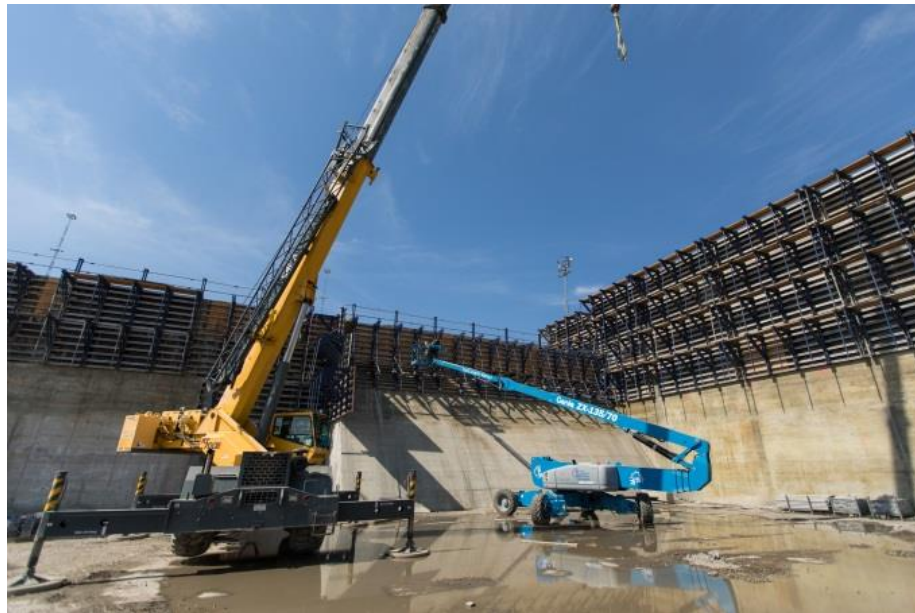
Roller Compacted Concrete Placement and Shotcrete Application at the Spillway Buttress on the Right Bank. Photo taken June 22, 2018.
